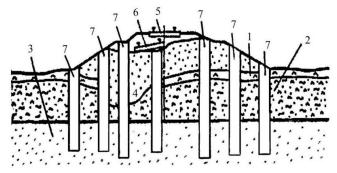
Diagram of embankment stabilization on peat swamps (sludge deposits) with soil reinforcement: 1 – peat crust; 2 – sludges; 3 – dense soils; 4 – collapse with a breakdown of peat crust; 5, 6 – road before and after the collapse, respectively; 7 – reinforced soil columns
